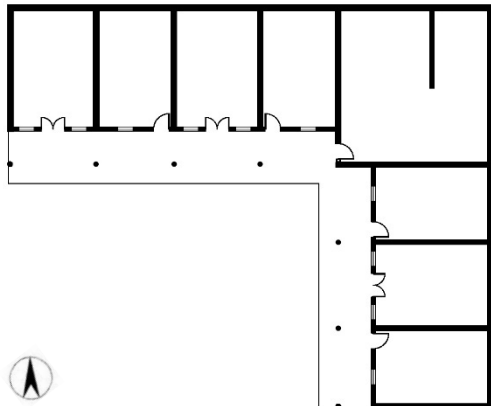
The typical plan layout of the “L”-shaped dwelling
